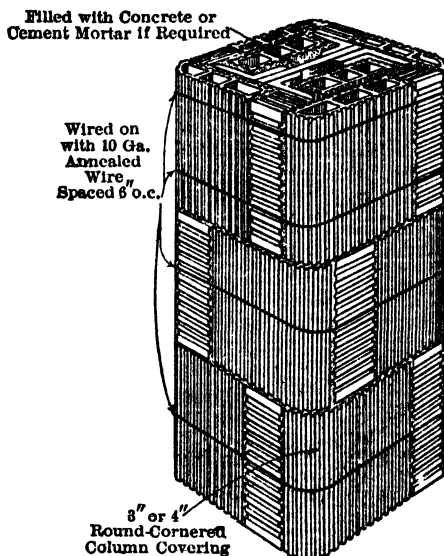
Application of Round Column Covering to Built-up I Column, Showing Use of Partition-tile "Pieces" as Fillers and Method of Wiring Tile in Place
